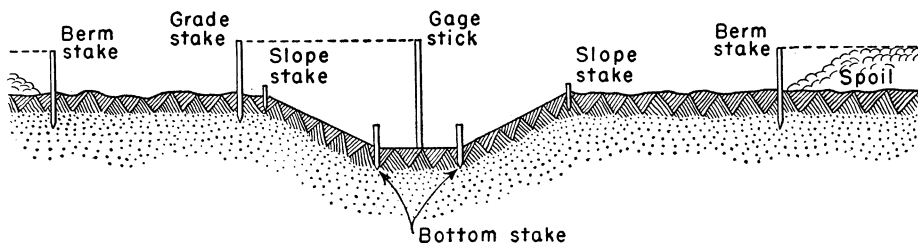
Cross section of ditch showing the location of the different kinds of construction stakes.
